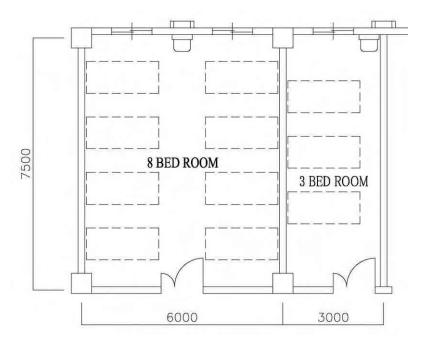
Plans of 8-bed Room and 3-bed Room
